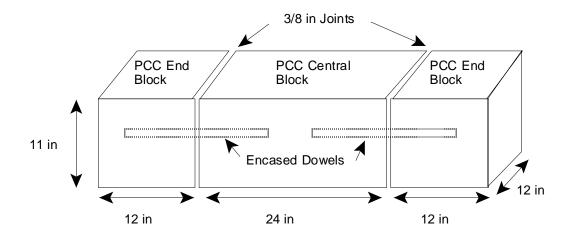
Schematic Illustration of Joint Deflection Test Specimen
